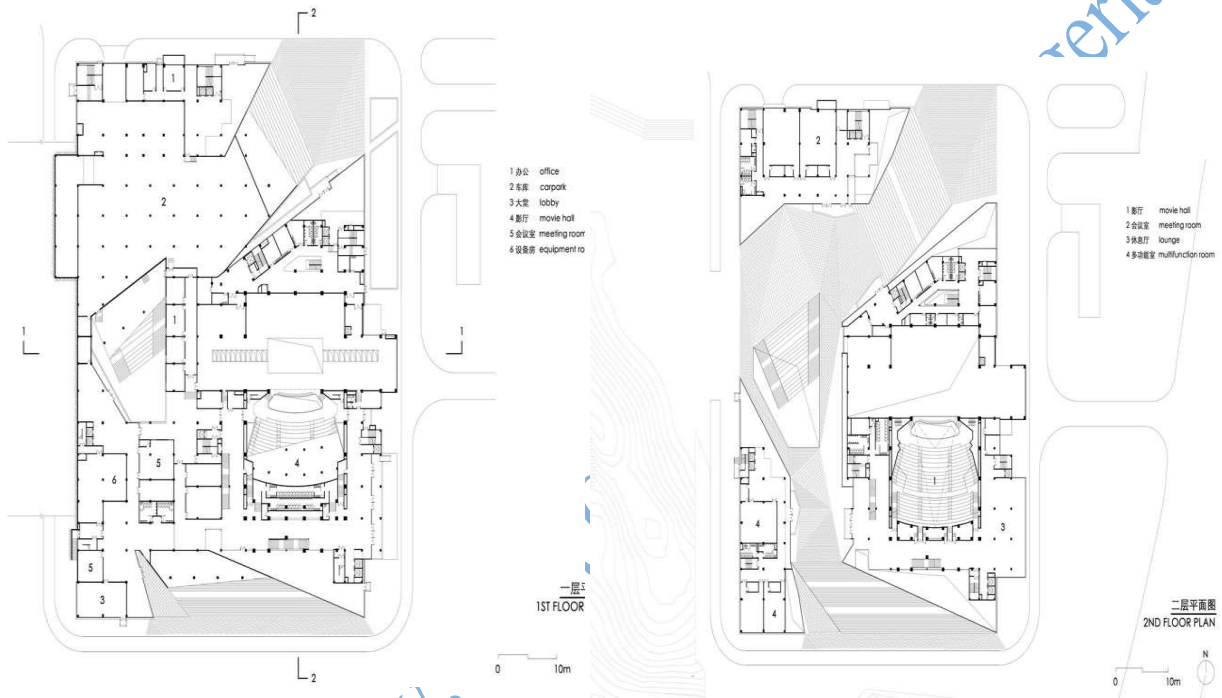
First Floor Plan of the Bishan Cultural and Art Center
